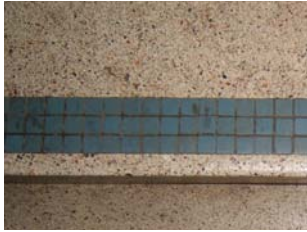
Terrazzo with blue mosaic detail can be found on the ground floor entrance lobby floor
